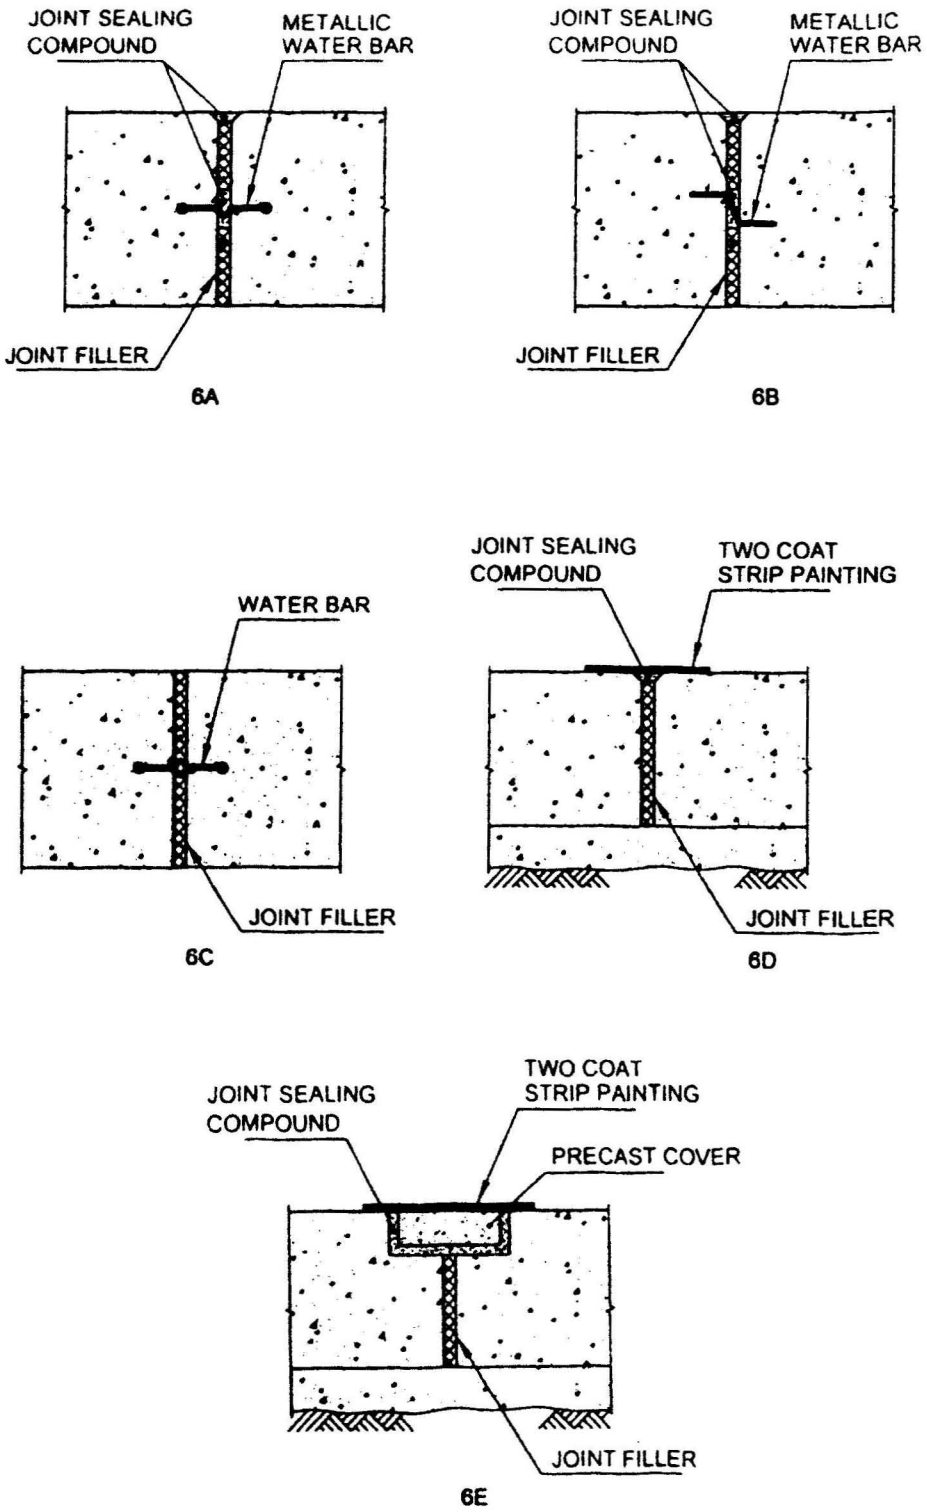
TYPICAL DETAILS SHOWING USE OF JOINTING MATERIALS IN MOVEMENT JOINTS (EXPANSION TYPE)
